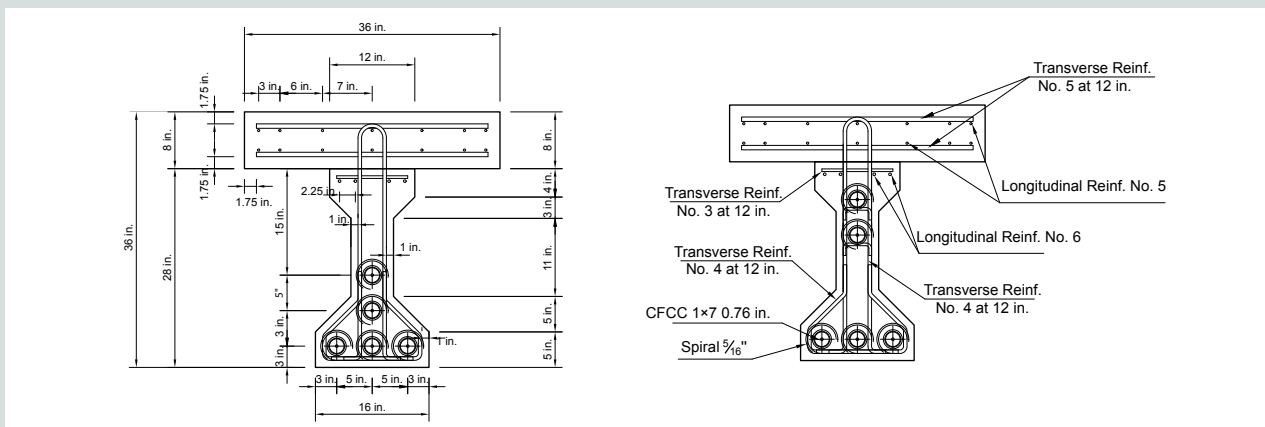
Typical reinforcement details for full-scale post-tensioned concrete beams with draped cables. Note: CFRP = carbon-fiber-reinforced polymer. No. 3 = 10 M; no. 4 = 13M; no. 5 = 16M; no. 6 = 19M. 1 in. = 25.4 mm.
